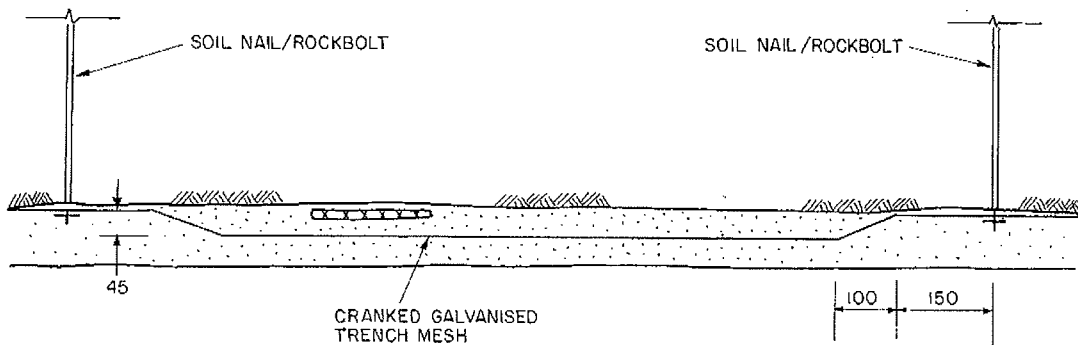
Bolt head, fibrecrete and trench mesh layout in plan.
